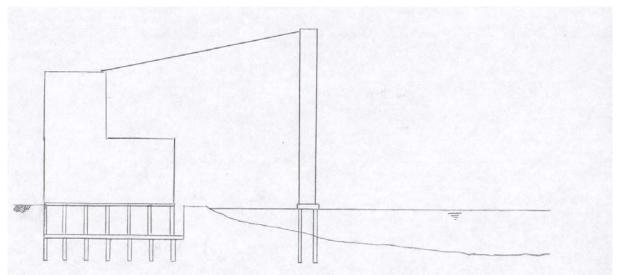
Stage 4: Erection of the pylons and anchoring them to the building.
